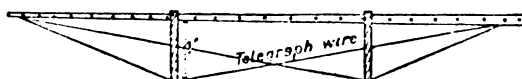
TRUSSED LADDERS. TWO STRUTS.
